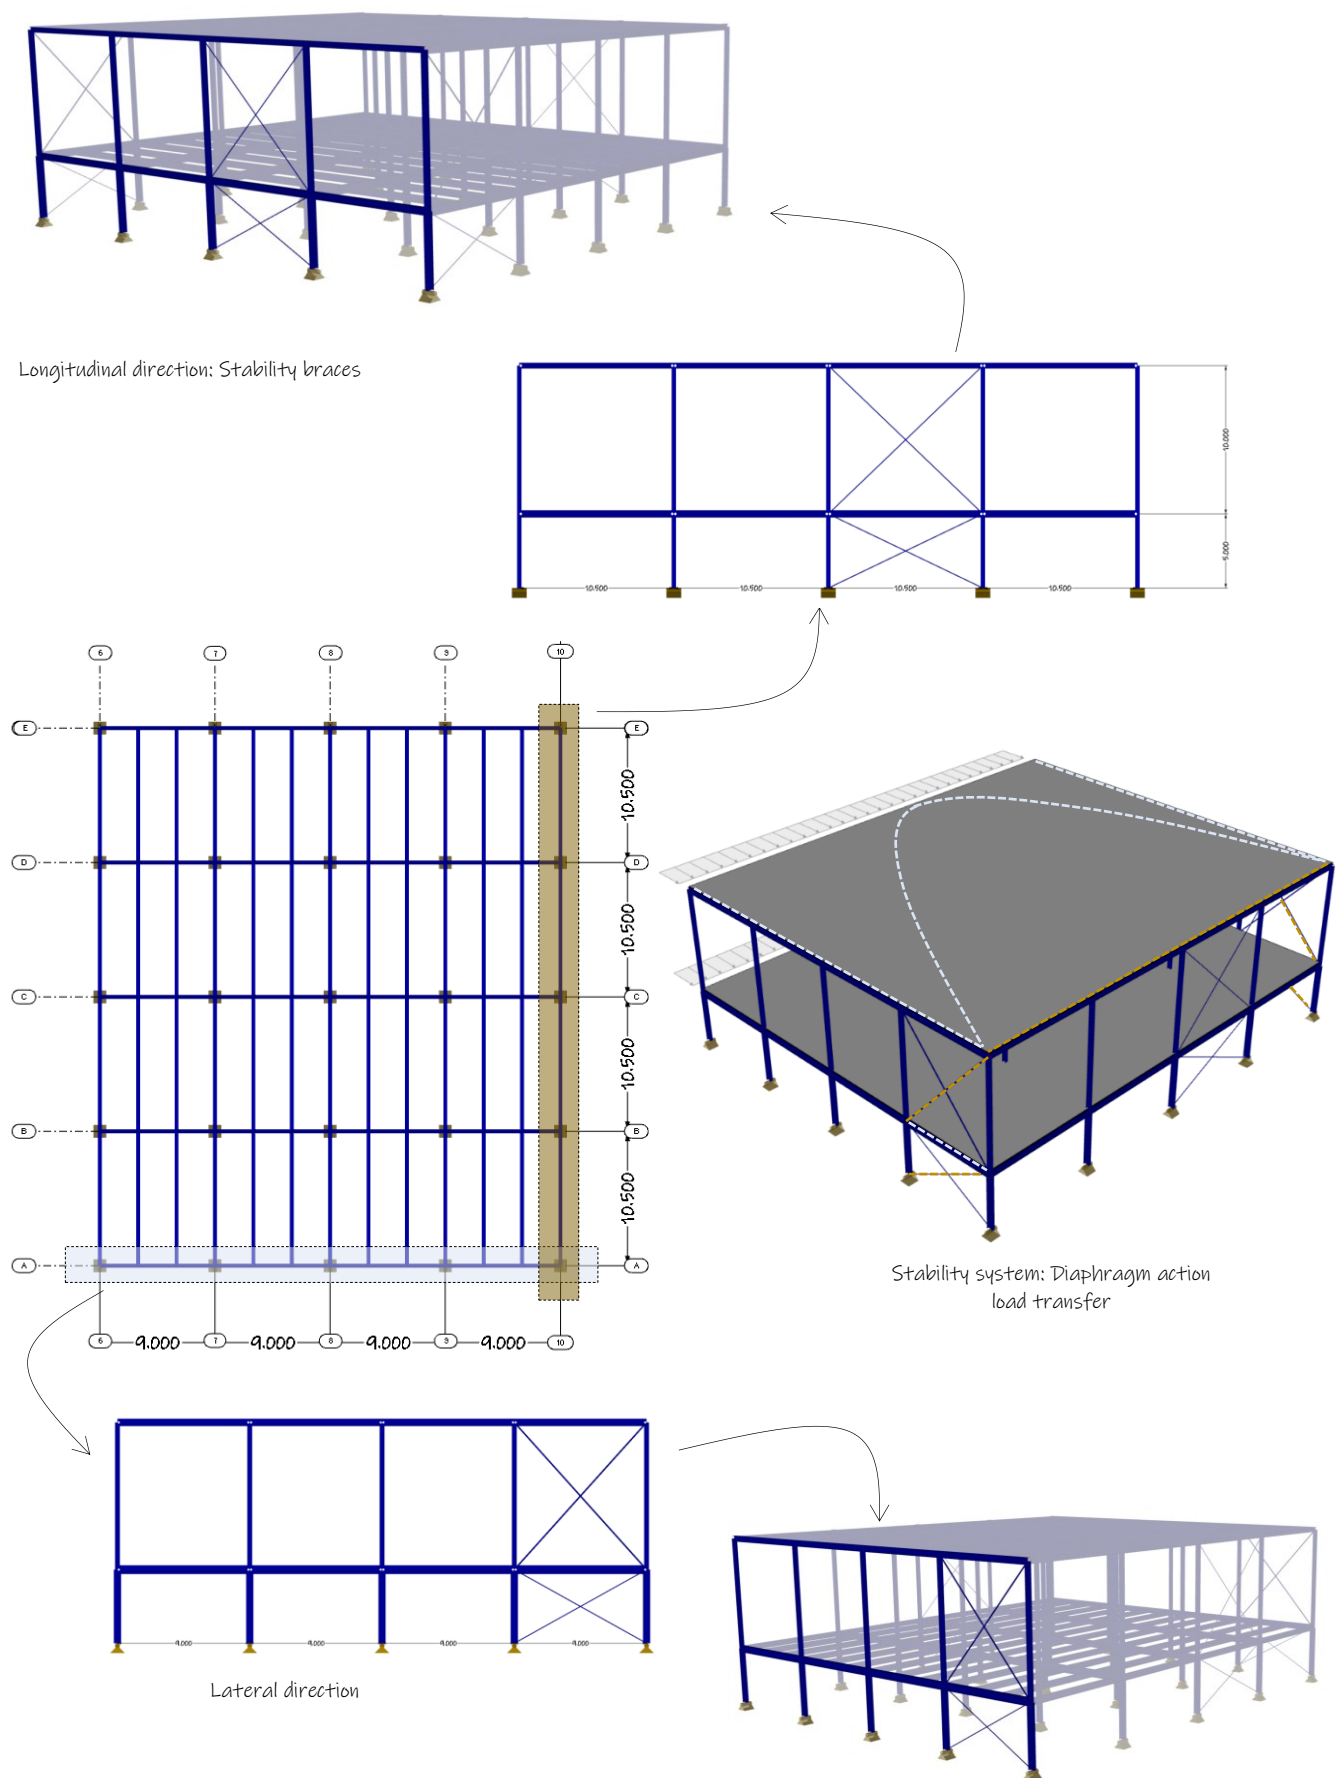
Scalable design conceptual structural overview: Side views, floor plan, and stability system
